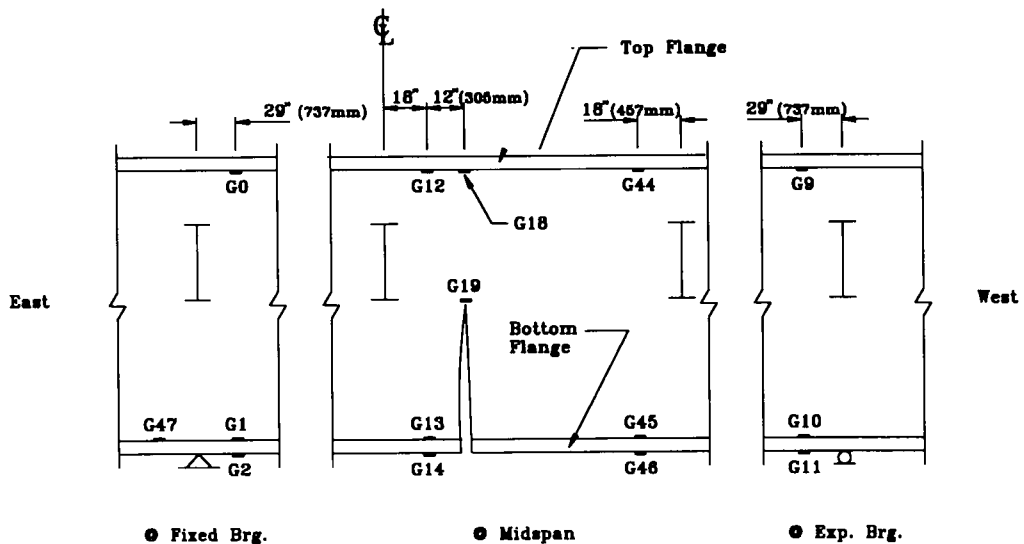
Positioning of strain gauges on north (damaged) girder (view from inside looking out).
